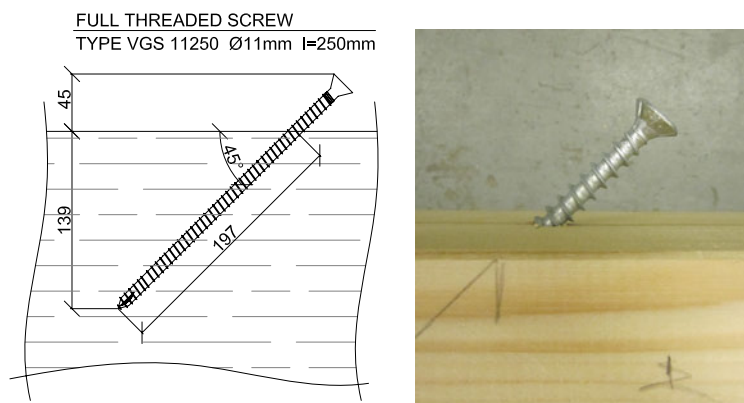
First step: screws installations in the glulam beam. Details of installation on the left and results of installation on the right.
